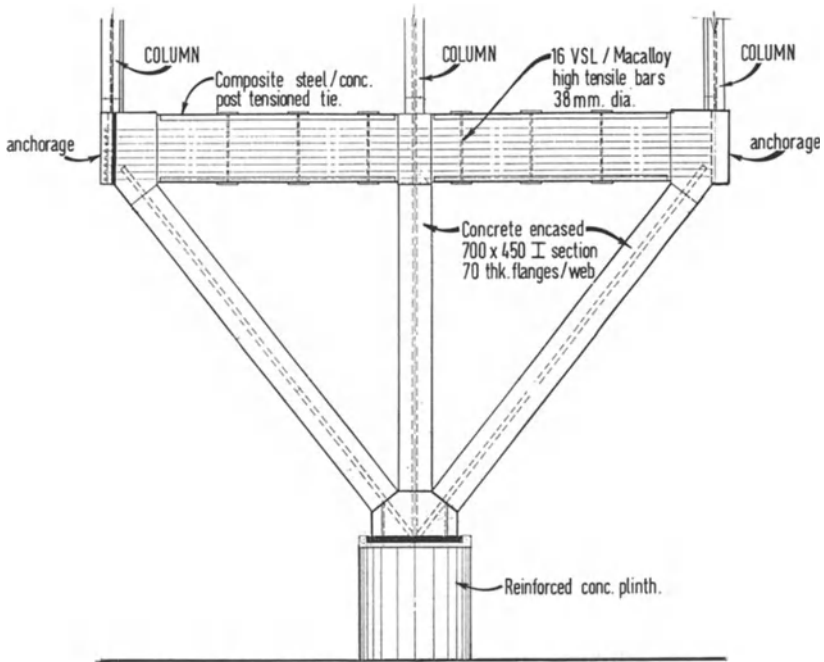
Piloti transfer structures, structural arrangement, Grosvenor Place Development, Sydney
